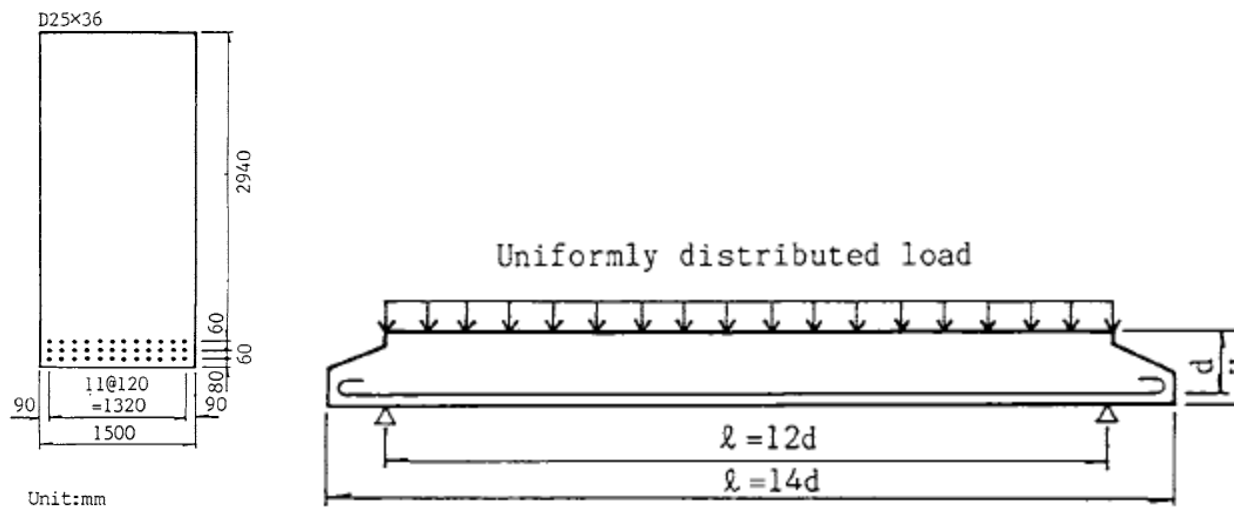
Experimental-tested beam and its cross section under uniform load [8]
